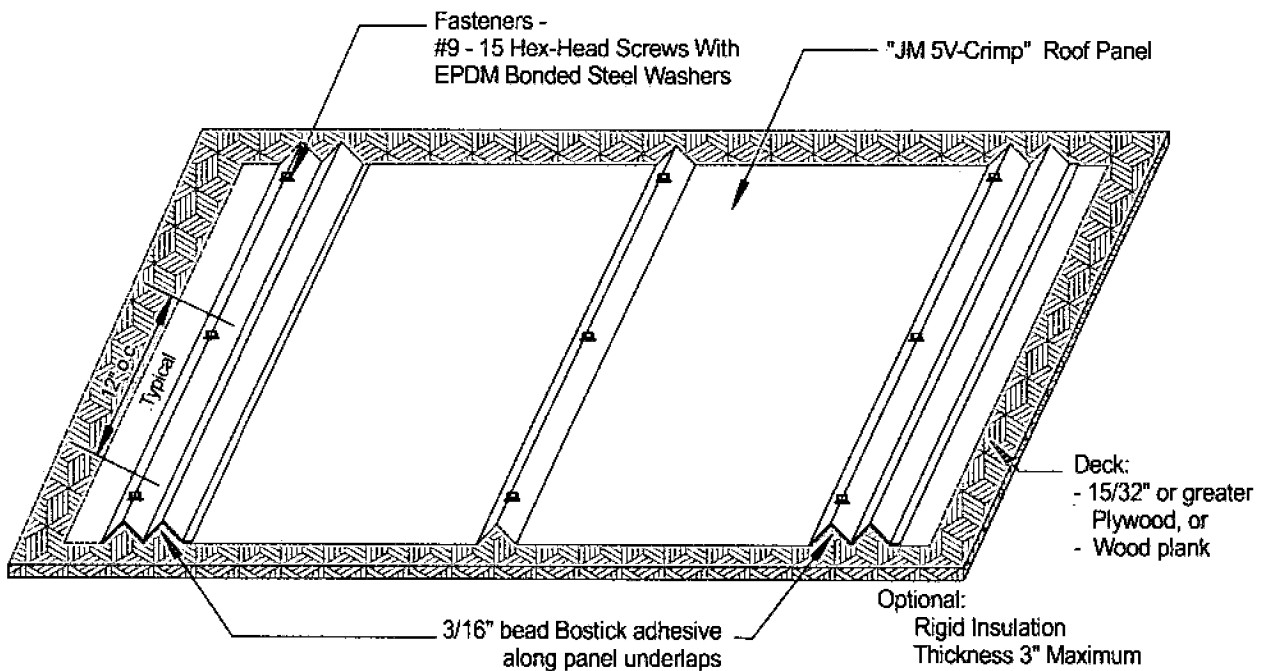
B - Typical Assembly Isometric View (METHOD 1)
